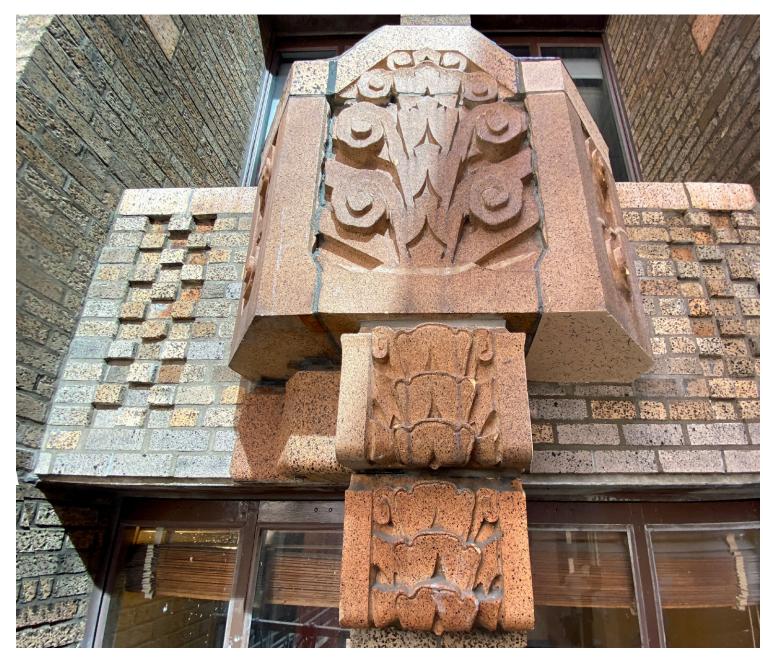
DETAIL OF DAMAGE AT LINTEL, BRICK, AND TERRACOTTA MEDALLION INTERFACE, TYPICAL OF ALL LOCATIONS TO VARYING DEGREES.
